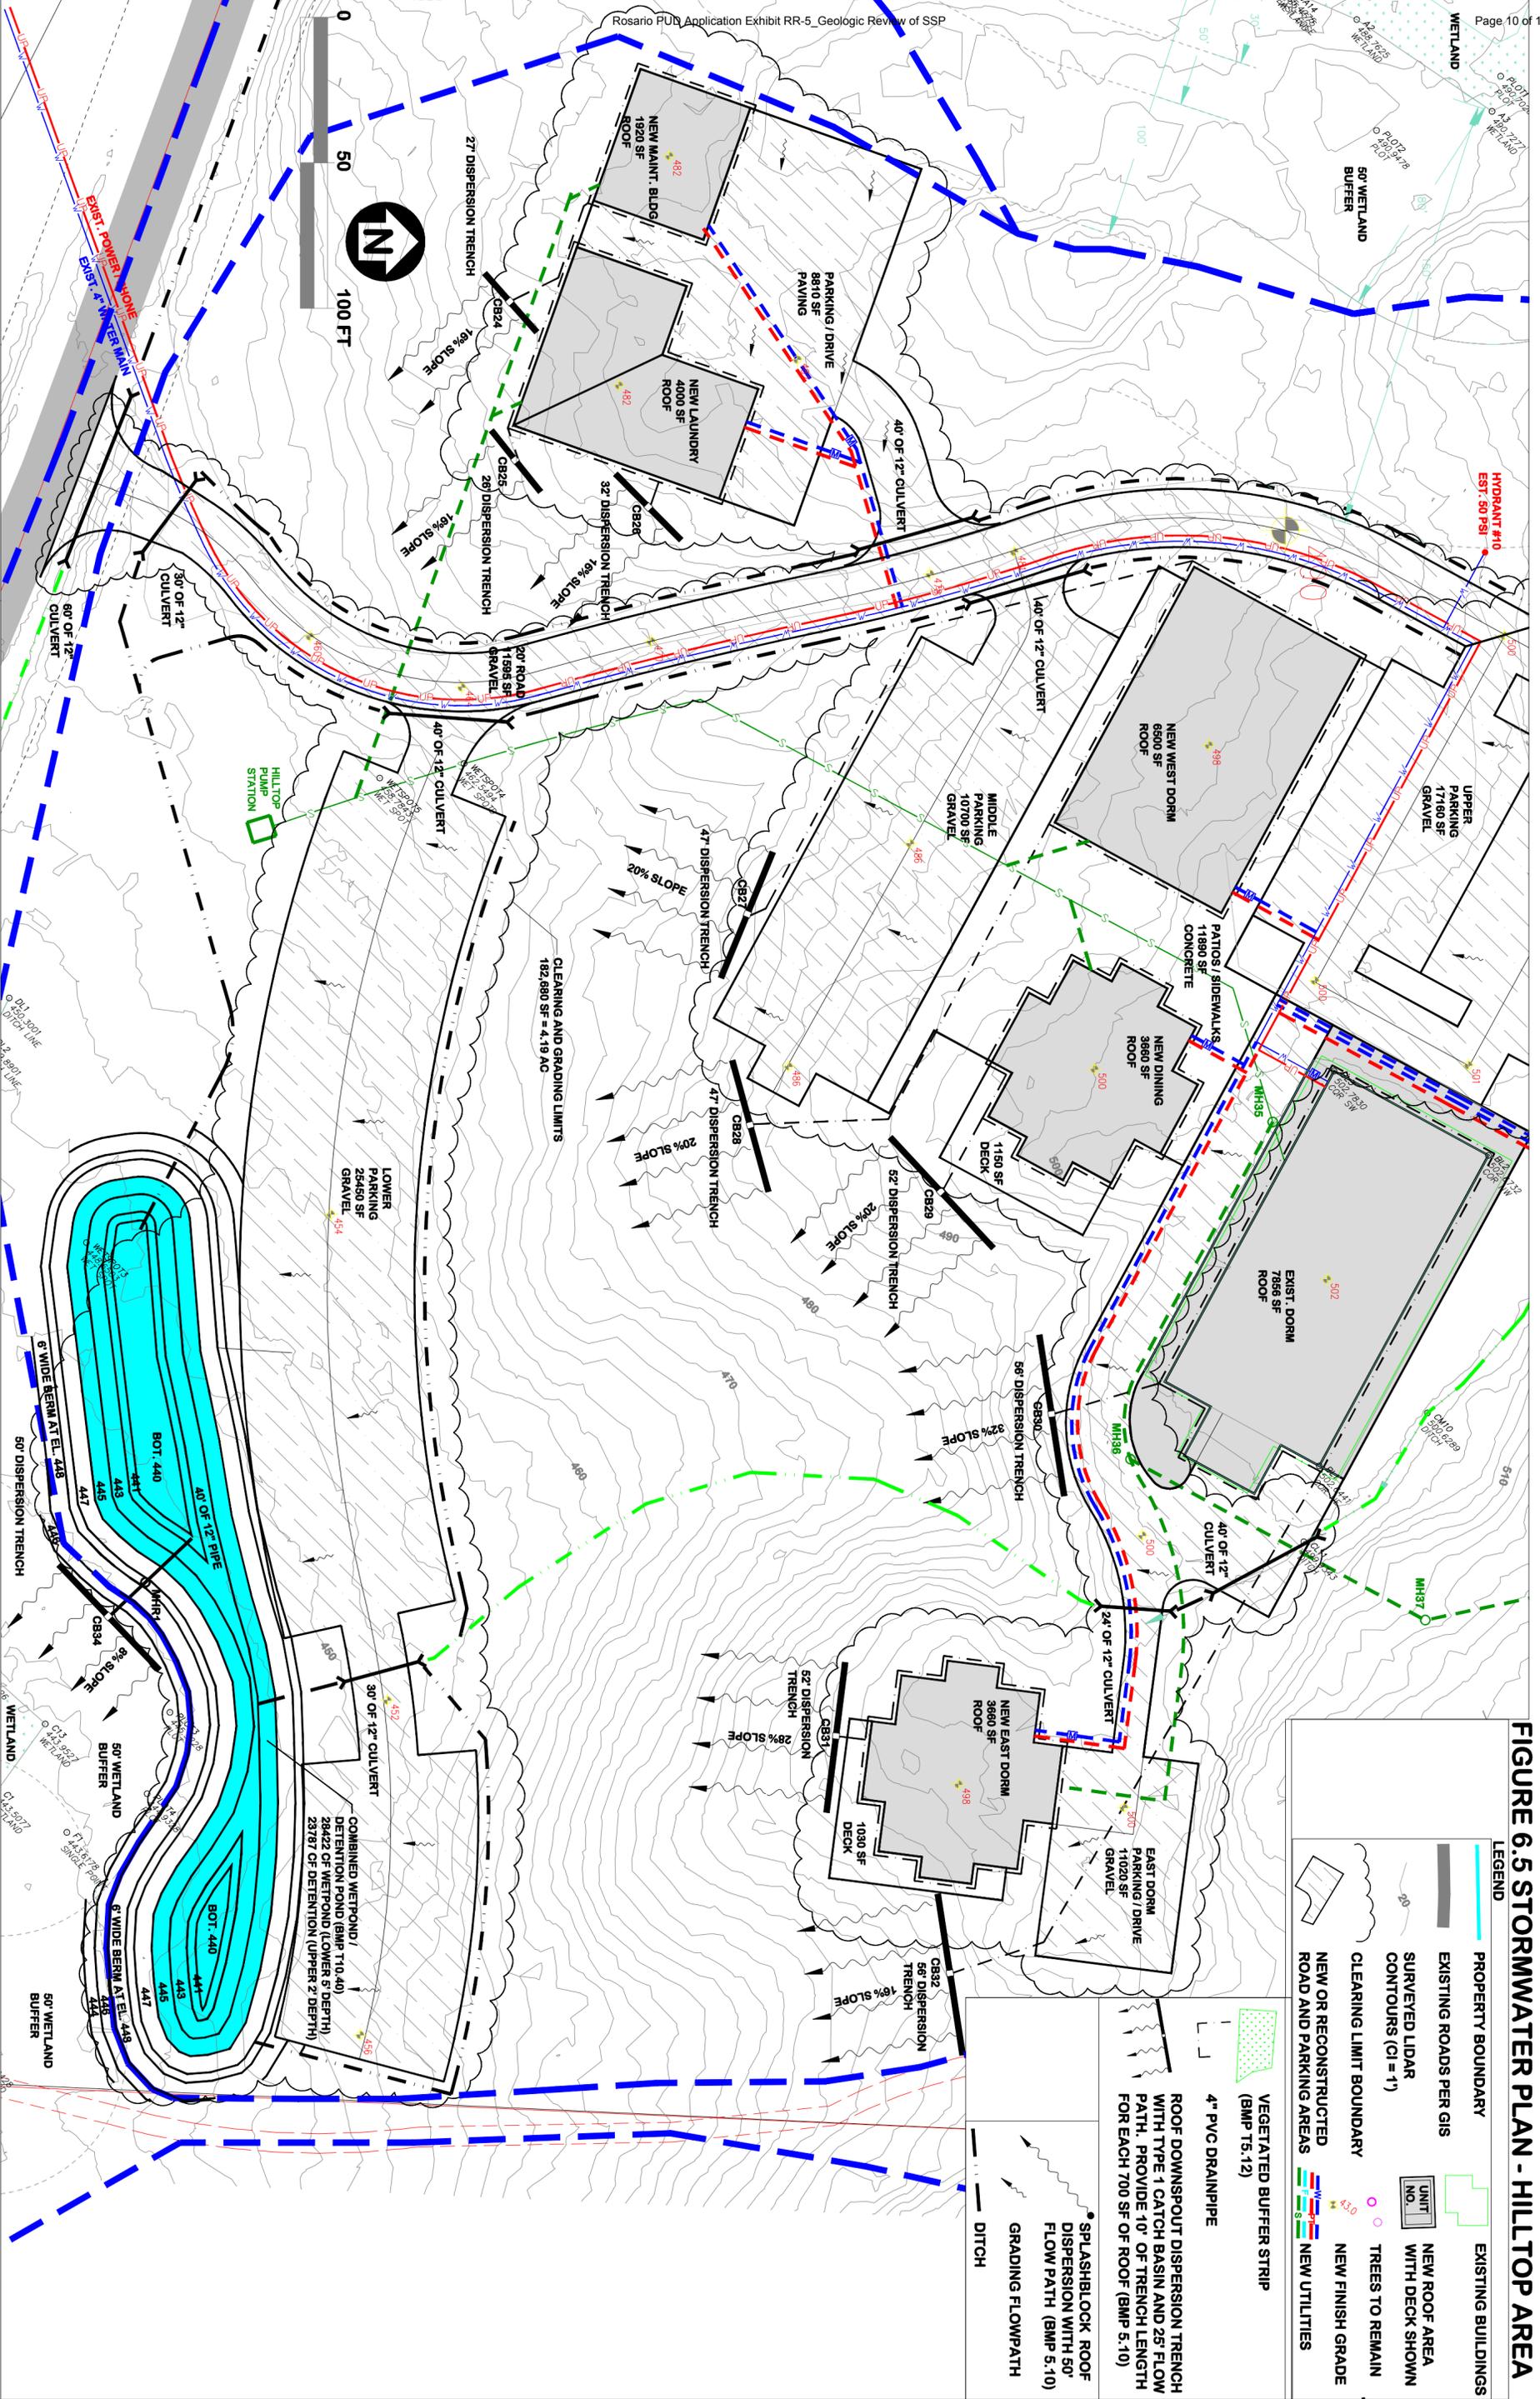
STORMWATER PLAN - HILLTOP AREA
